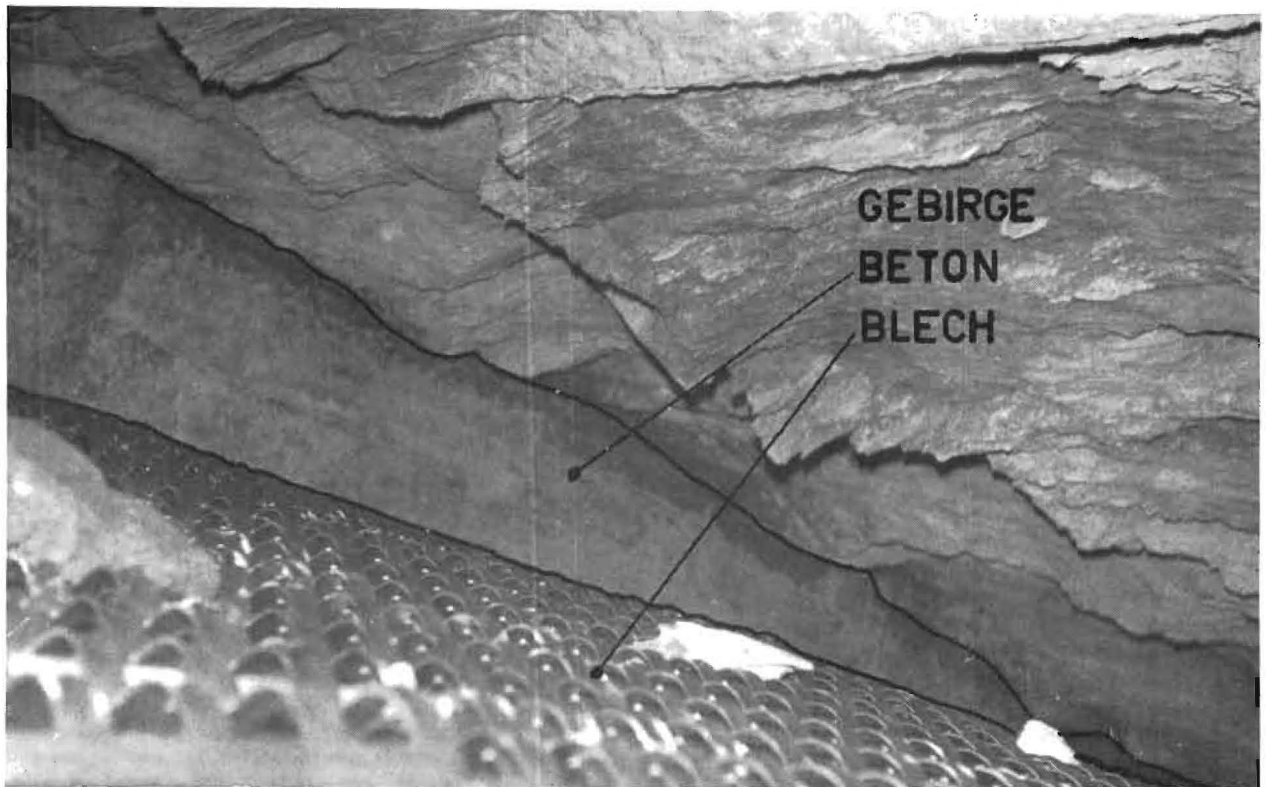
ROCK - CONCRETE - SHEET / ROCHE - BETON - TOLE
